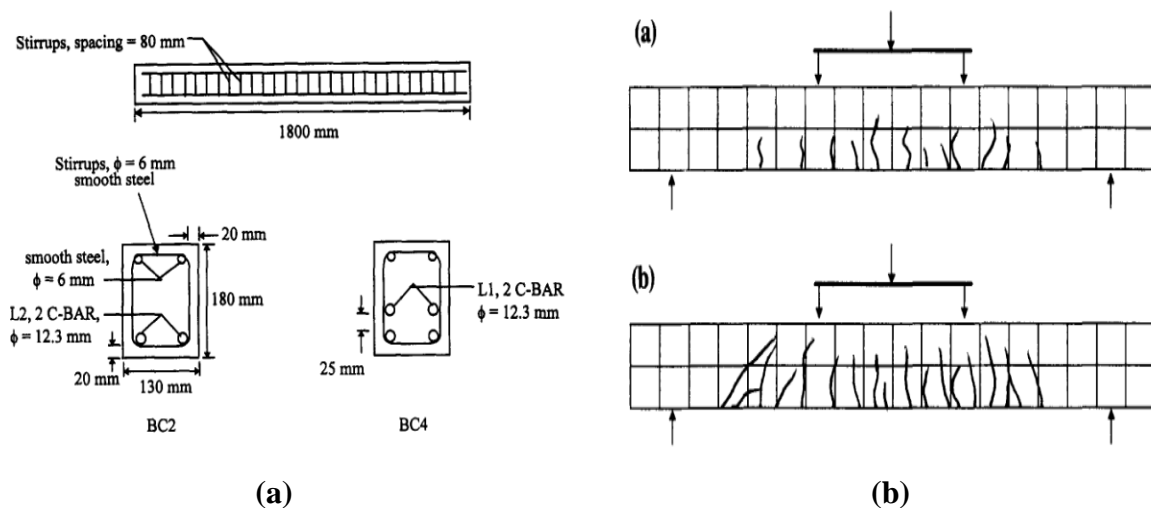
(a) Details of reinforcement and test specimen and (b) Cracking Pattern In BC4 and BC2 Specimen (Theriaule and Benmokrane, 1998)
